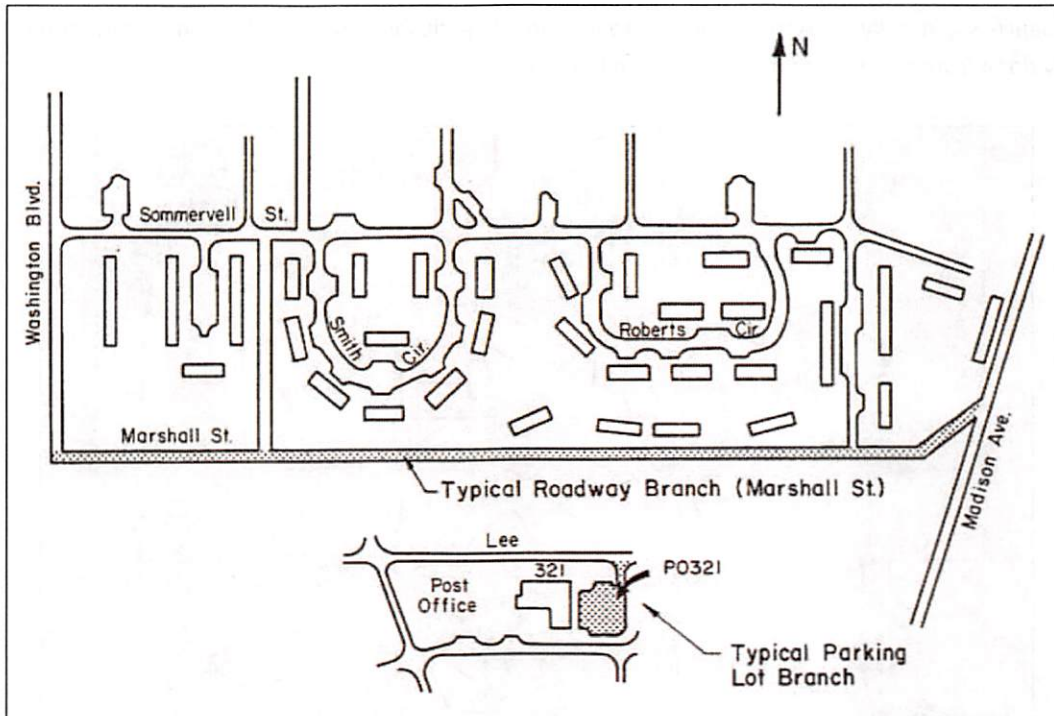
Example of pavement network (whole thing) and branch (as called out)
